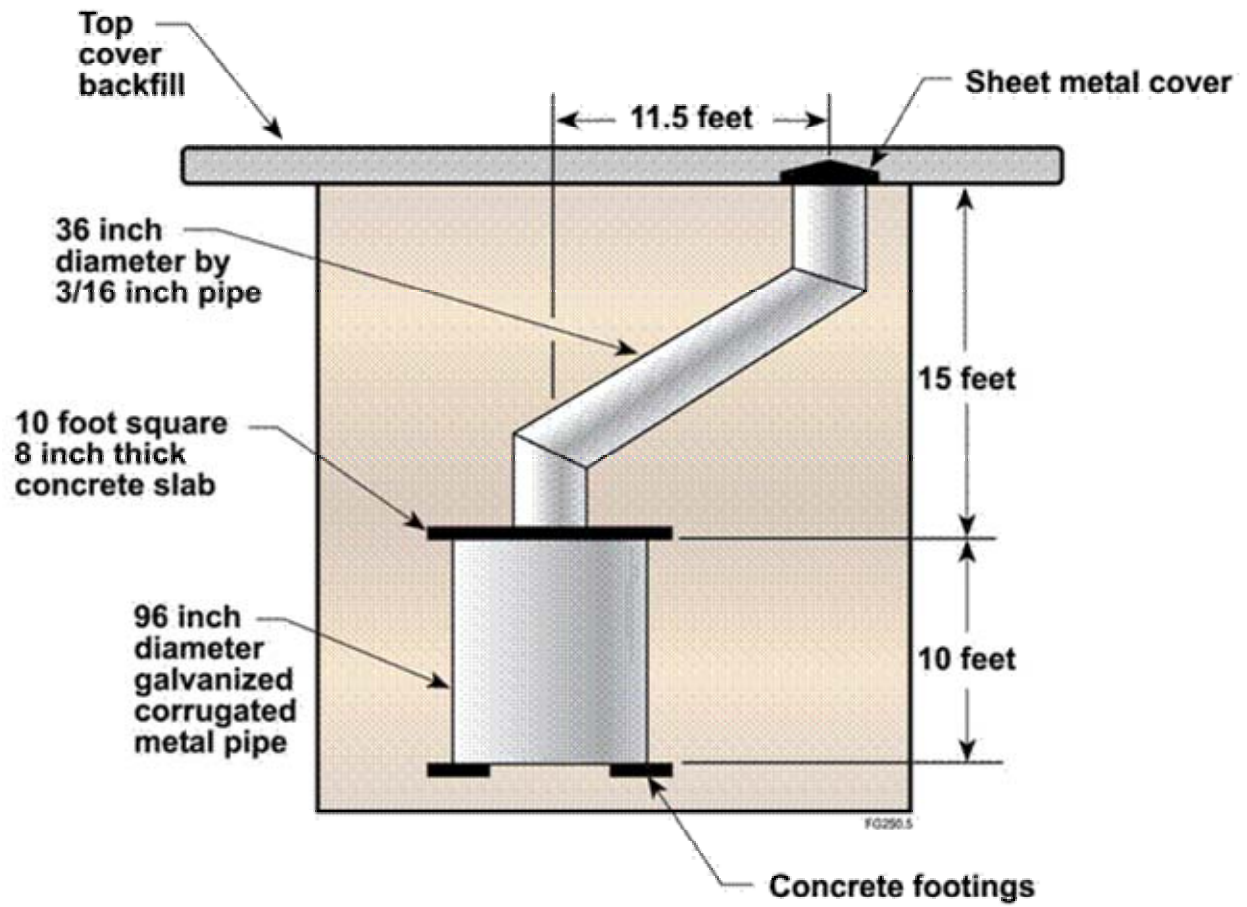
Typical Layout for 618-10 and 618-11 Burial Grounds.
